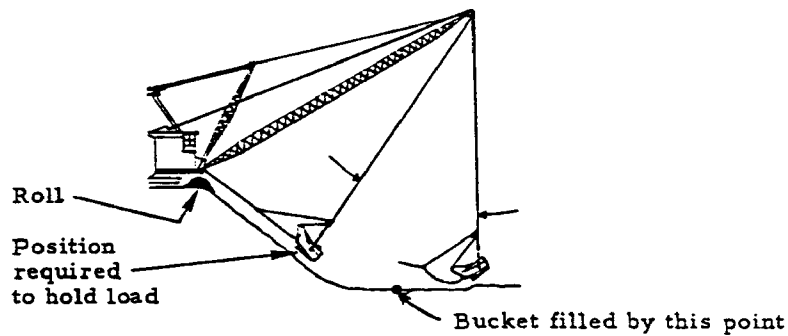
Section View Showing Dragging of Filled Bucket Before Hoisting to Prevent Spillage
